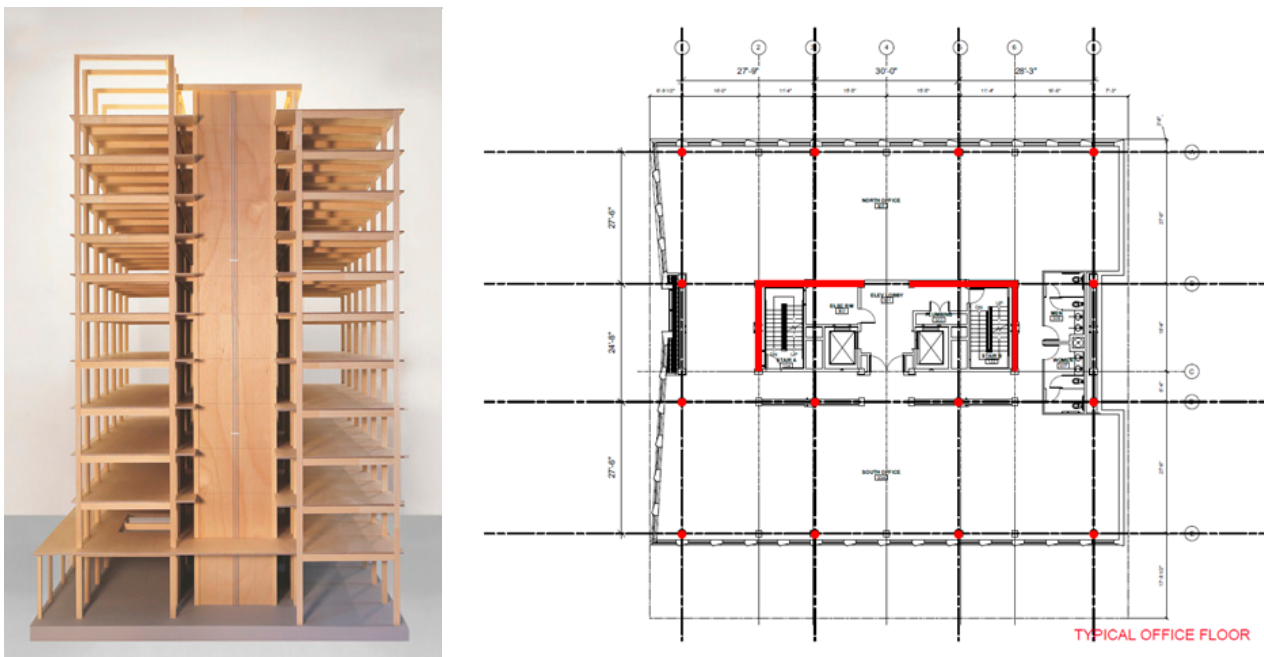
Image model of high-rise mass timber (Framework) building and main office floor plan.
